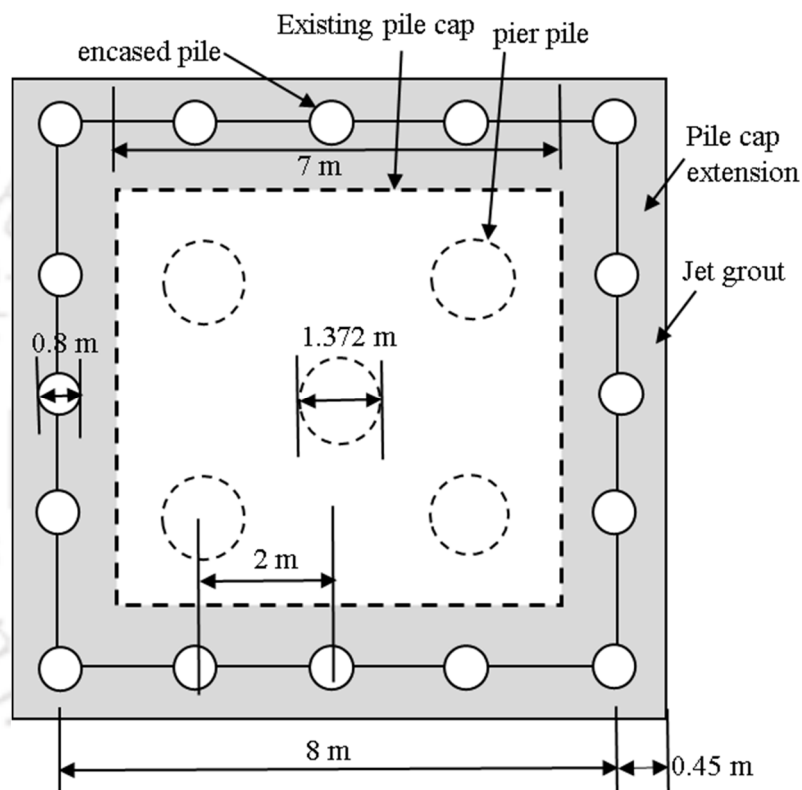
Plan view of pier pile foundation with encased piles in jet grout
